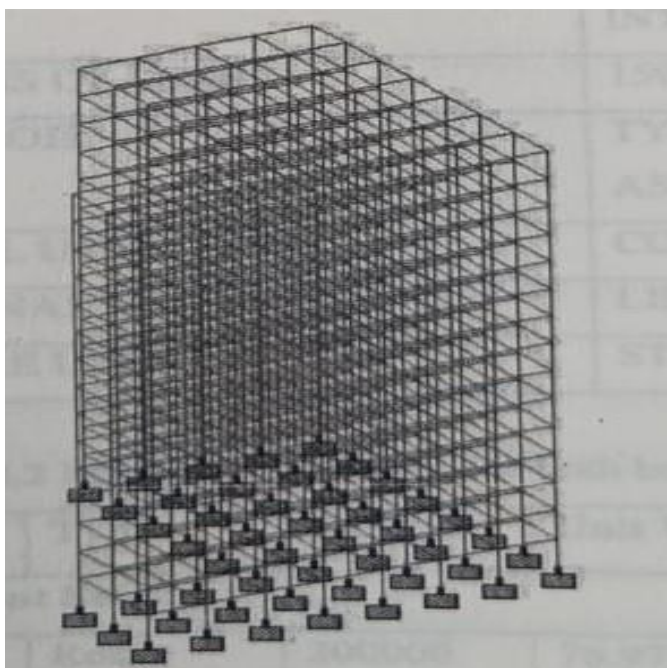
3D View of Model -2 (Building with plan irregular)
